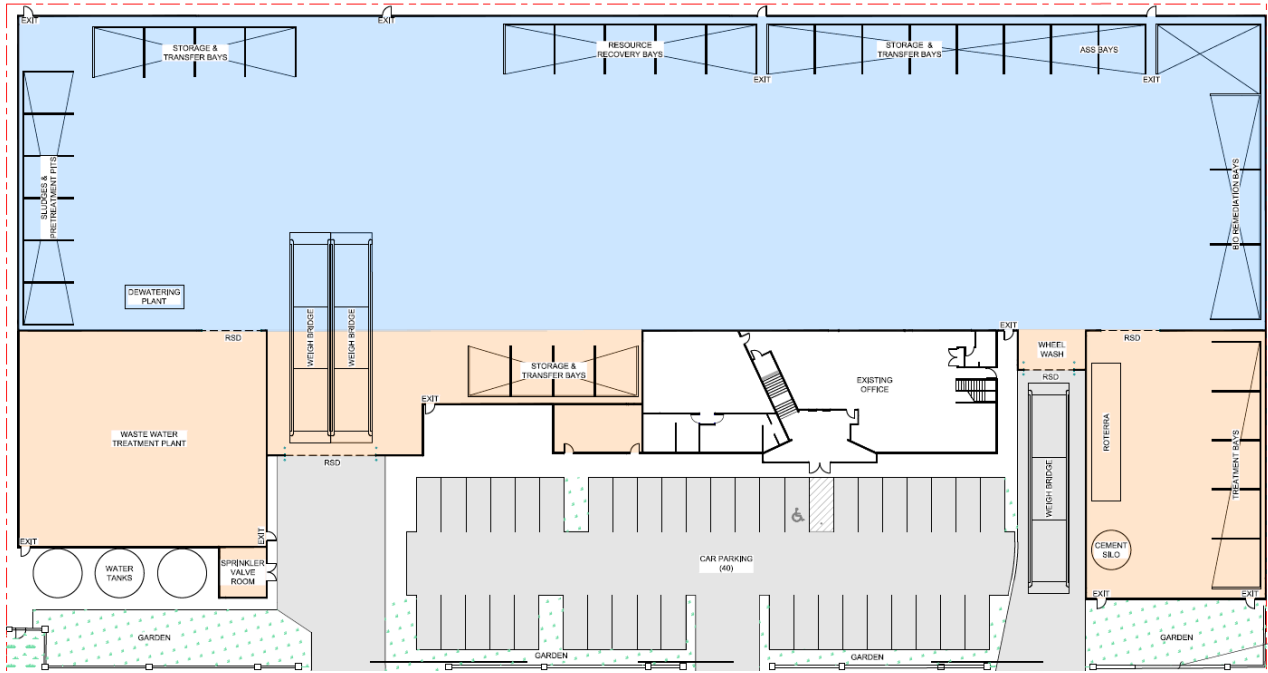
Proposed Layout of Storage Bunkers and Equipment
